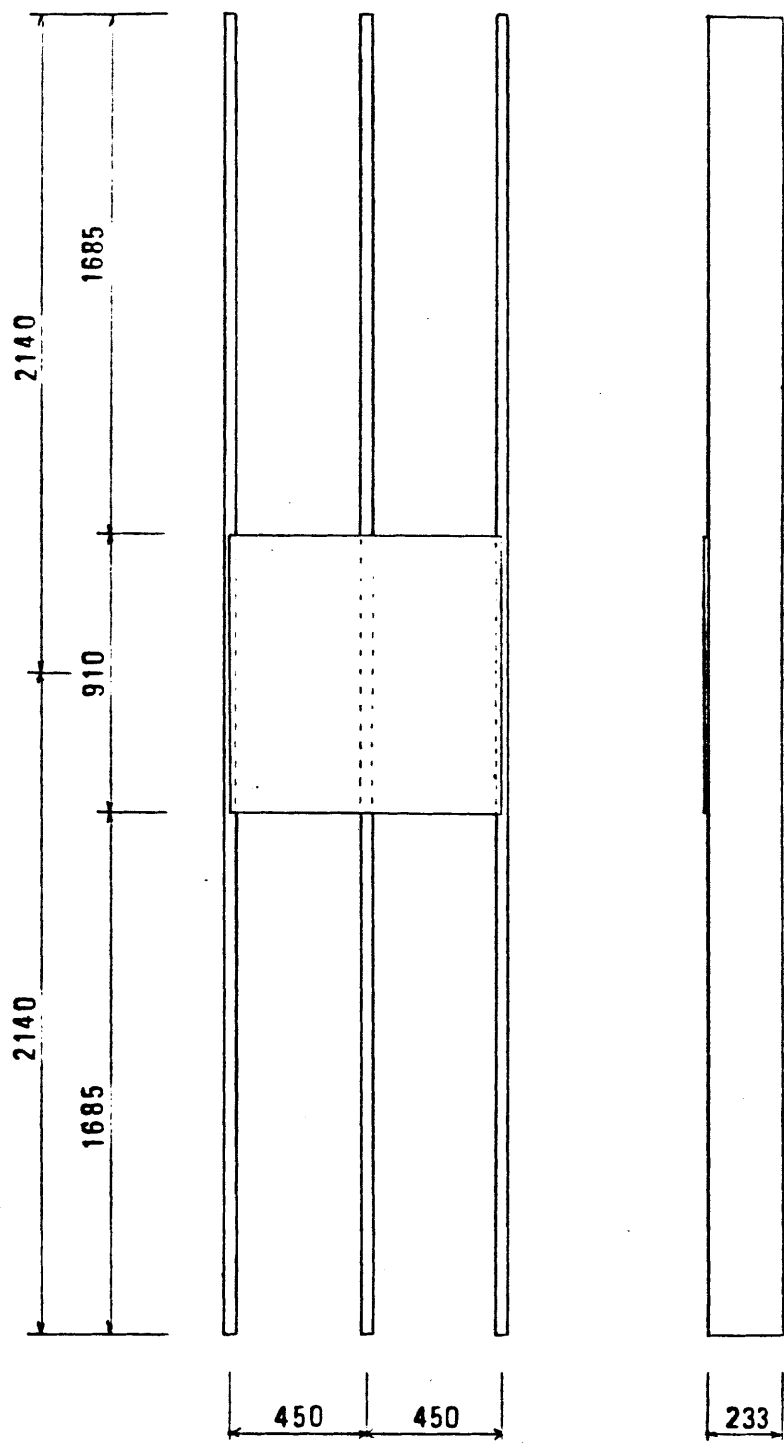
3 4 Construction detail of No. 8 -- 23 specimen.
